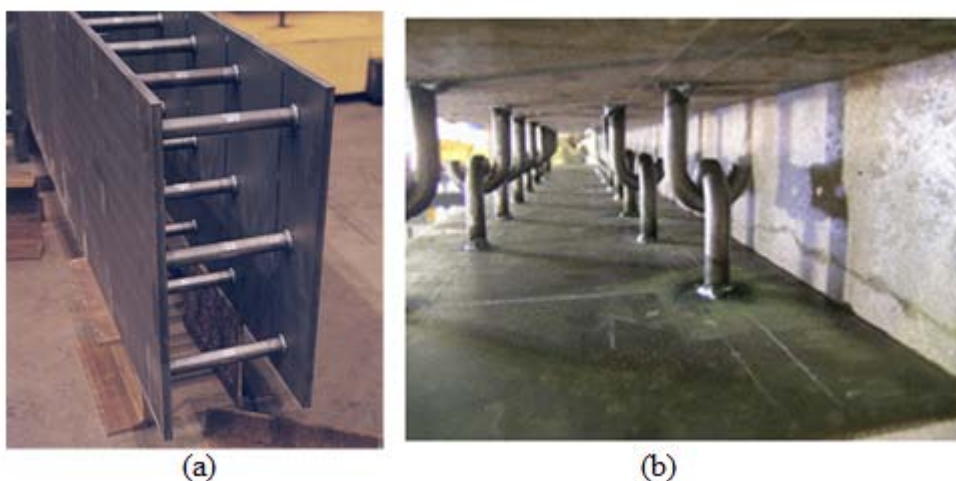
(a) Bi-steel panel before concrete casting (Hulton, 2010), (b) J-hook panel before concrete casting (Liew and Soheli, 2009)
